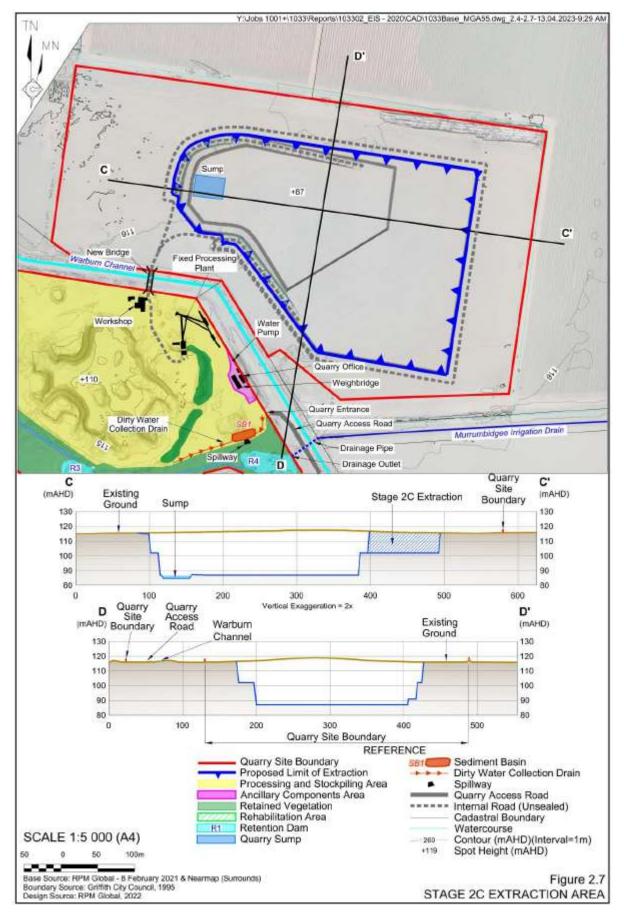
Proposed Extraction Stage 2C and Cross-Sections
